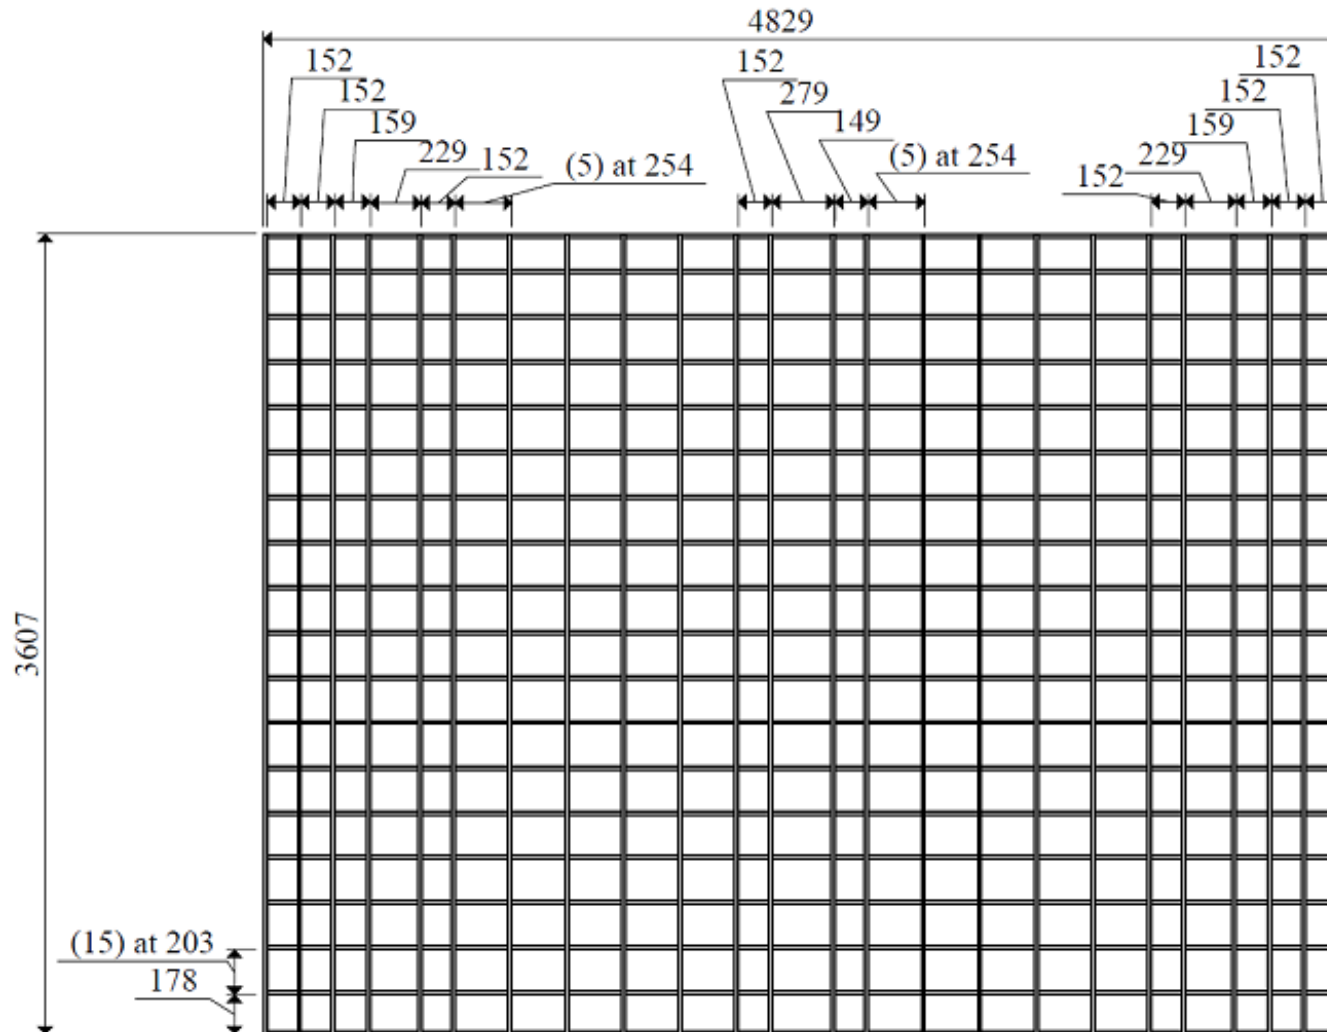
Top layer of steel reinforcement for deck slab- plan view
